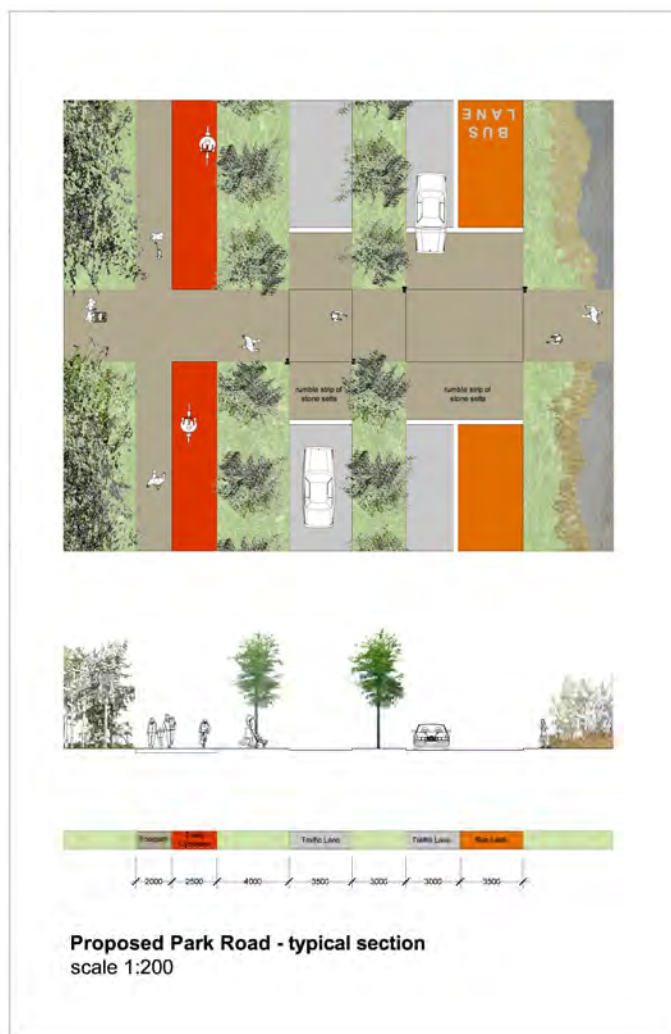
Typical Section across Dyke Road (Park Road) indicating Pedestrian Crossings
